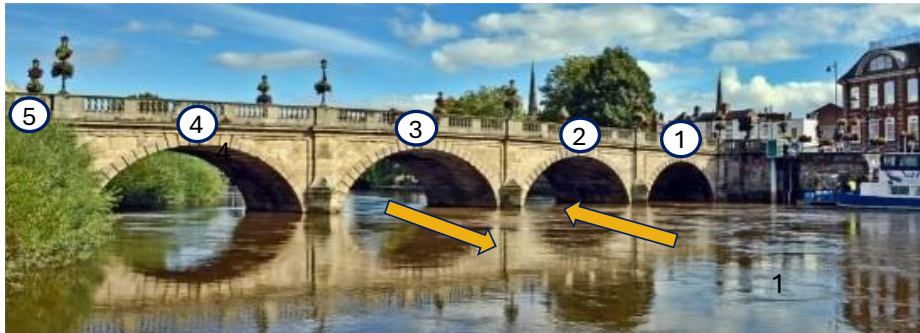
Welsh Bridge Viewed Looking Upstream
